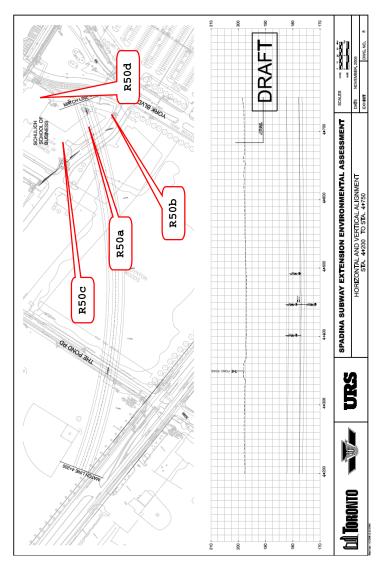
PLAN AND PROFILE OF THE PROPOSED SUBWAY ALIGNMENT
